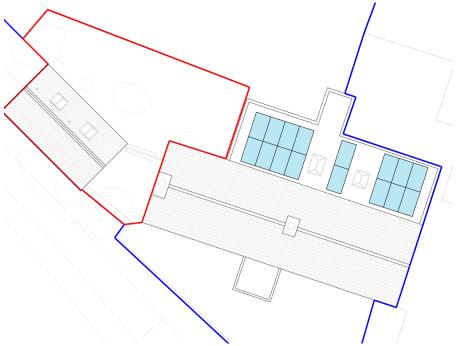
Proposed Site Plan With Location Of Proposed Solar Panel Array Position.
